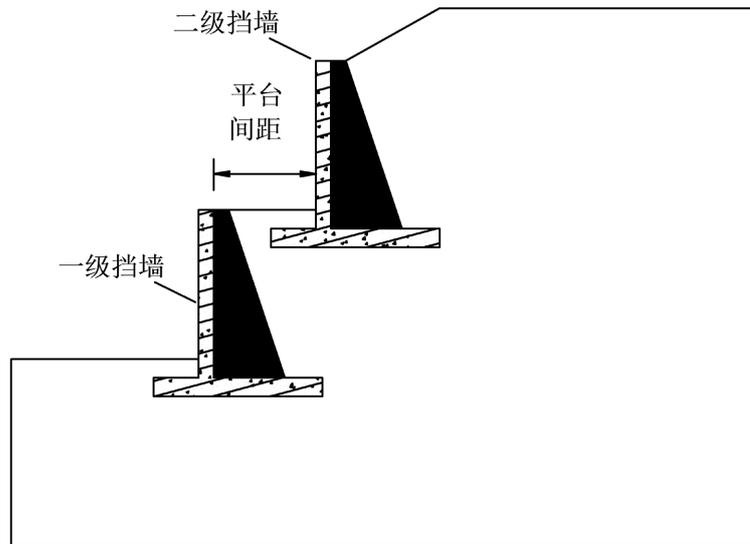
Schematic diagram of platform spacing of two-stage fabricated retaining wall
